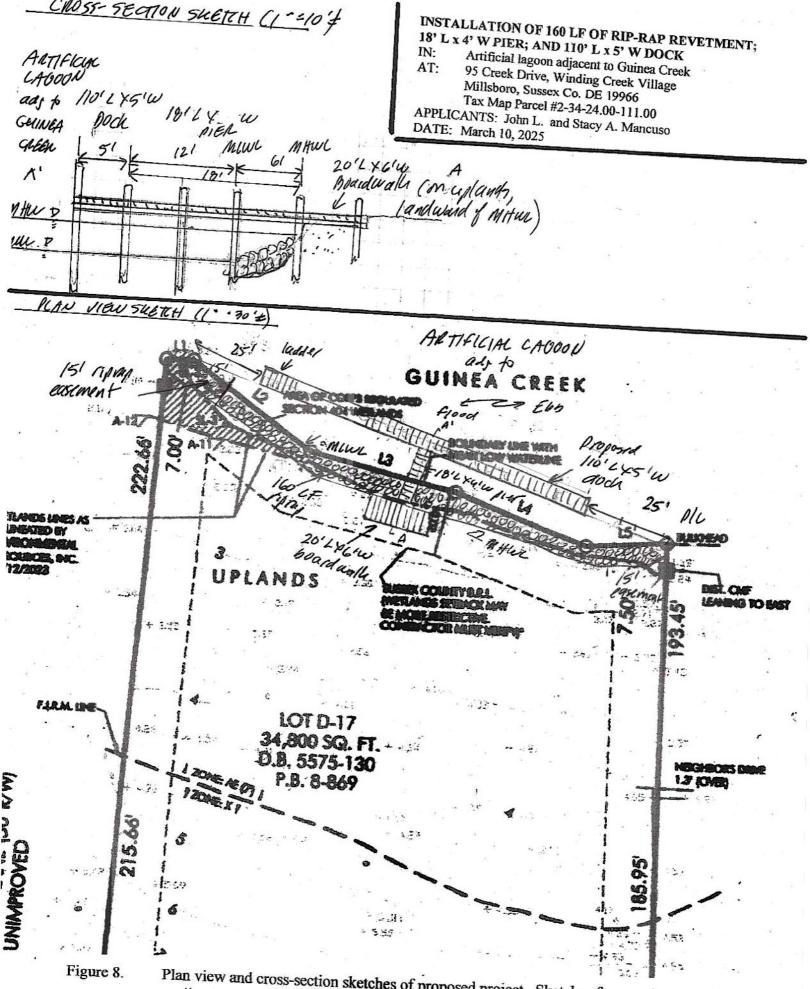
Plan view and cross-section sketches of proposed project. Sketches for permit application purposes only.
